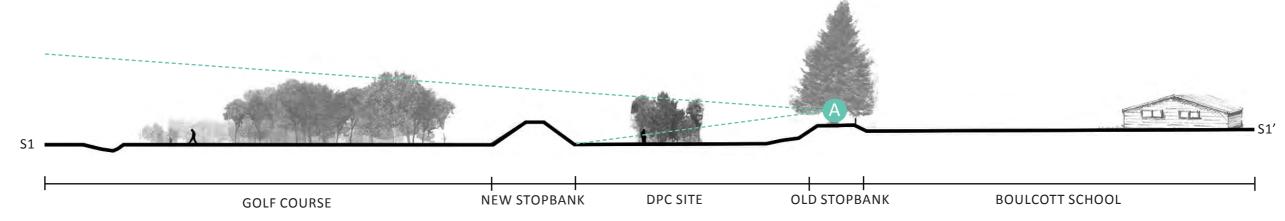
SECTION ONE Scale: 1:1000 @ A3
